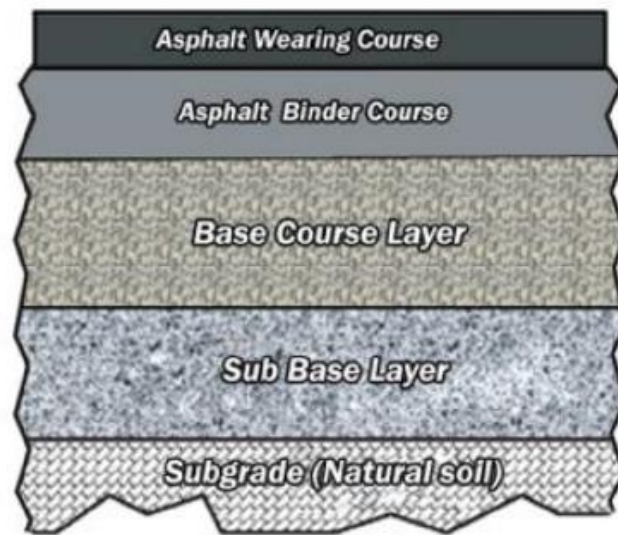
Typical flexible pavement vertical section structure (Mohammed, 2013)
